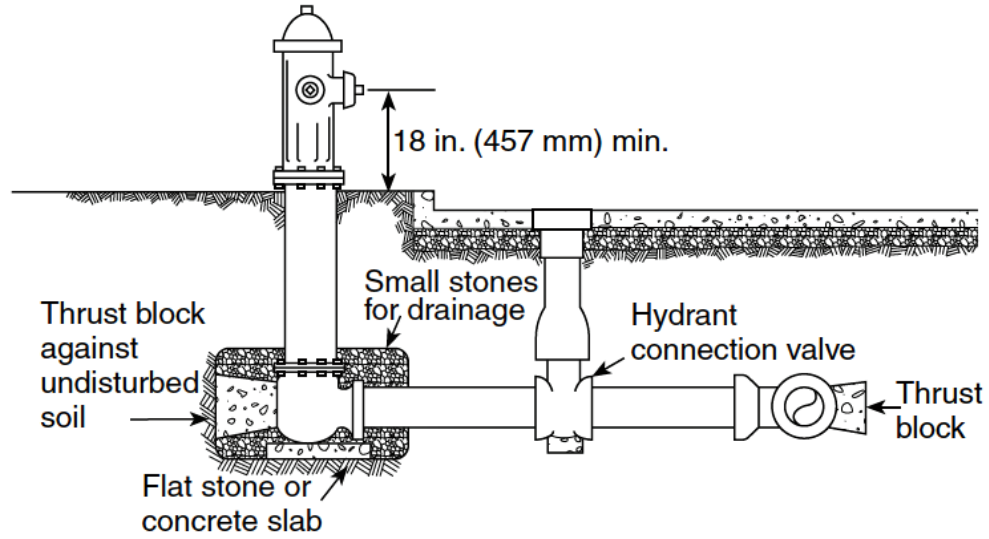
(a) Typical Hydrant Connection with a Minimum Height Requirement.
